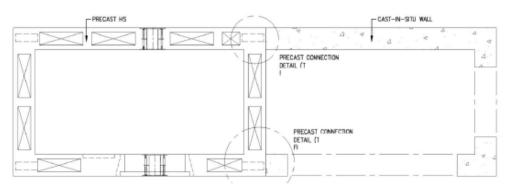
J - Precast SS Adjoining Cast In-Situ Walls/Columns
